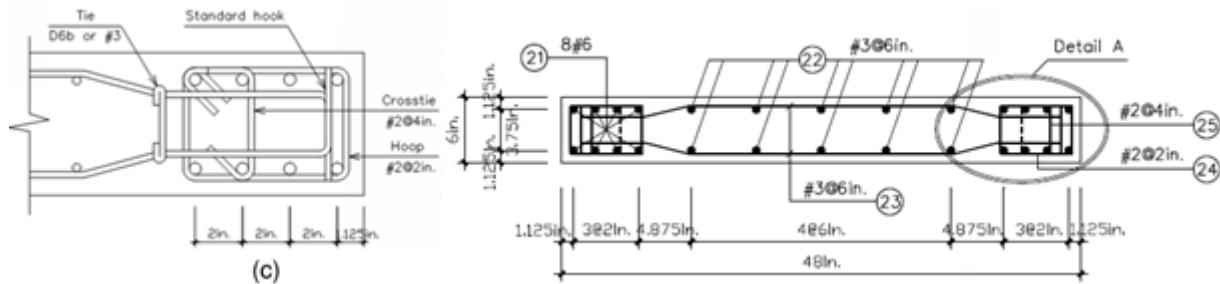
Base View of Section and Boundary Element Detail for Specimen RW-A20-P10-S63 (Tran 2012)
